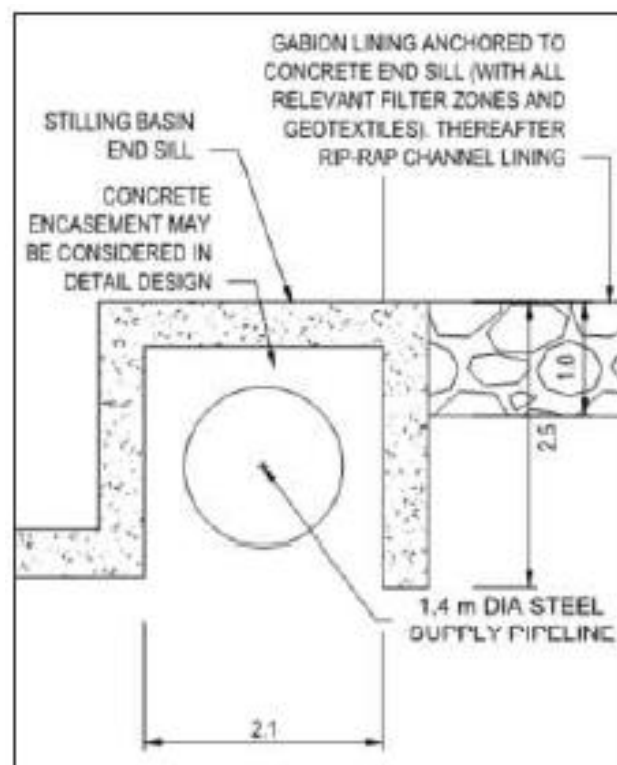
Typical detail of pipe underneath spillway (DWS, 2020)
